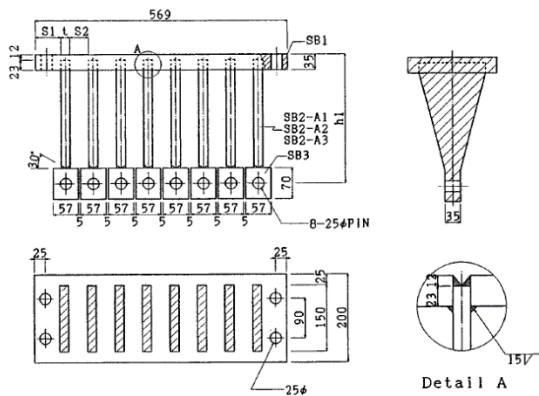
Details of Steel Welded TADAS device (units in mm) [14]
